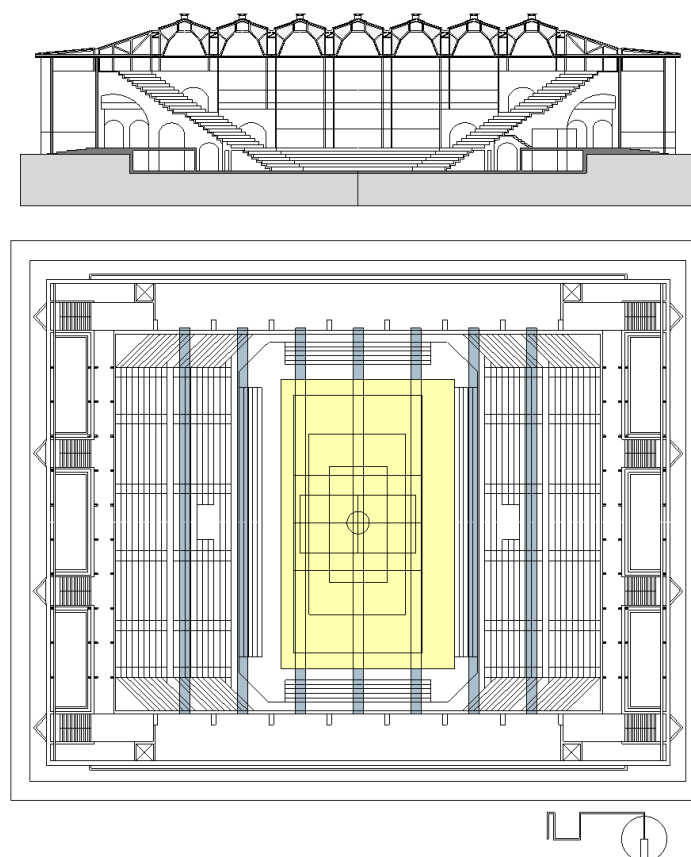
Floor plan and cross section (East - West) of the Palau d'Esports de Granollers PEG building.
